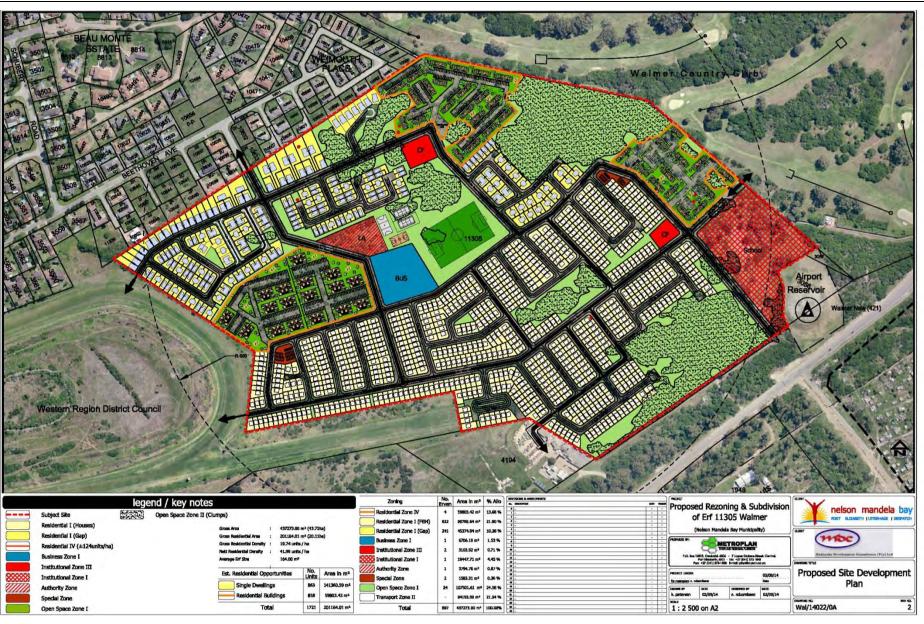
Preliminary proposed site development plan Layout Alternative 3
